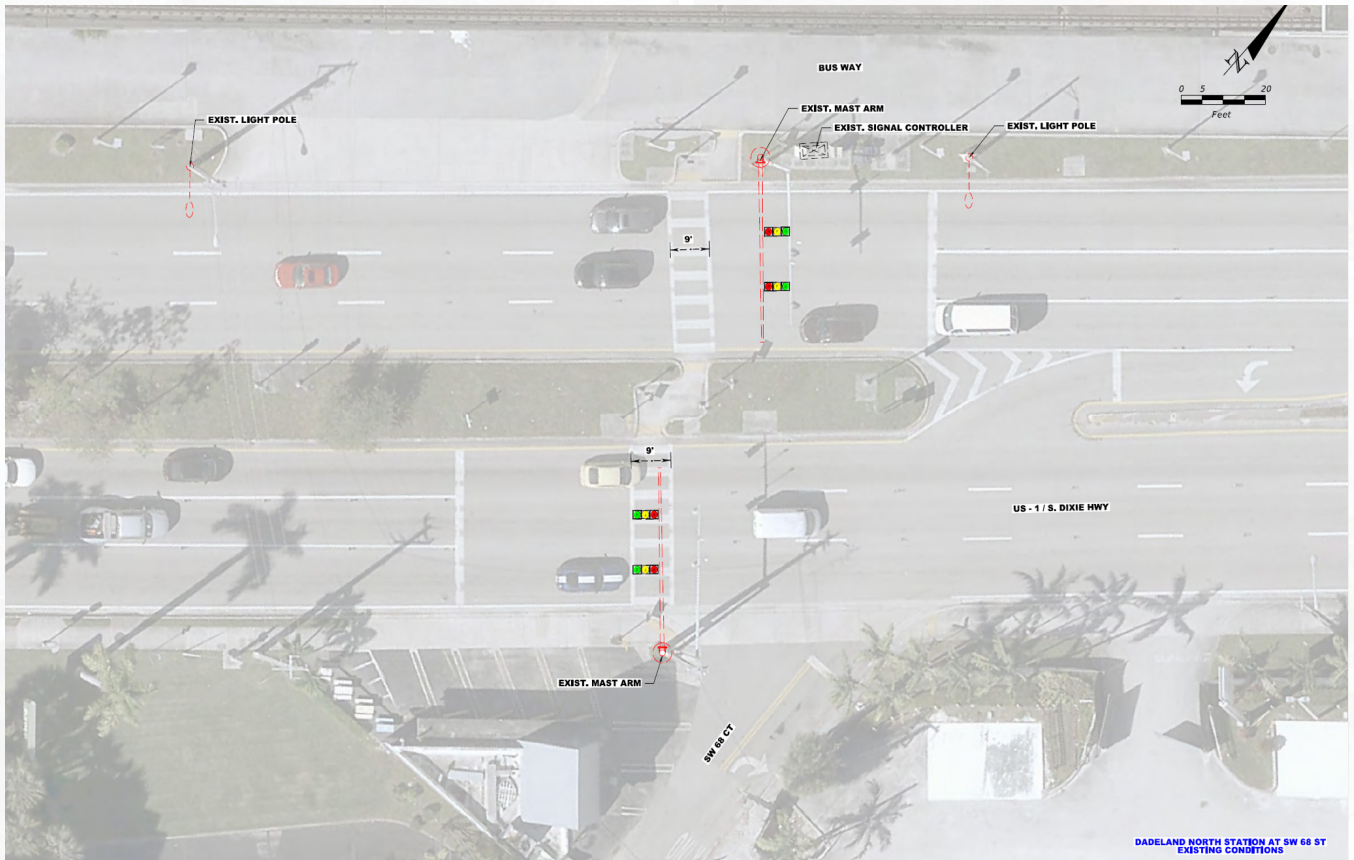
Dadeland North Metrorail Station Intersection at US-1 and SW 68th Street Existing Conditions
